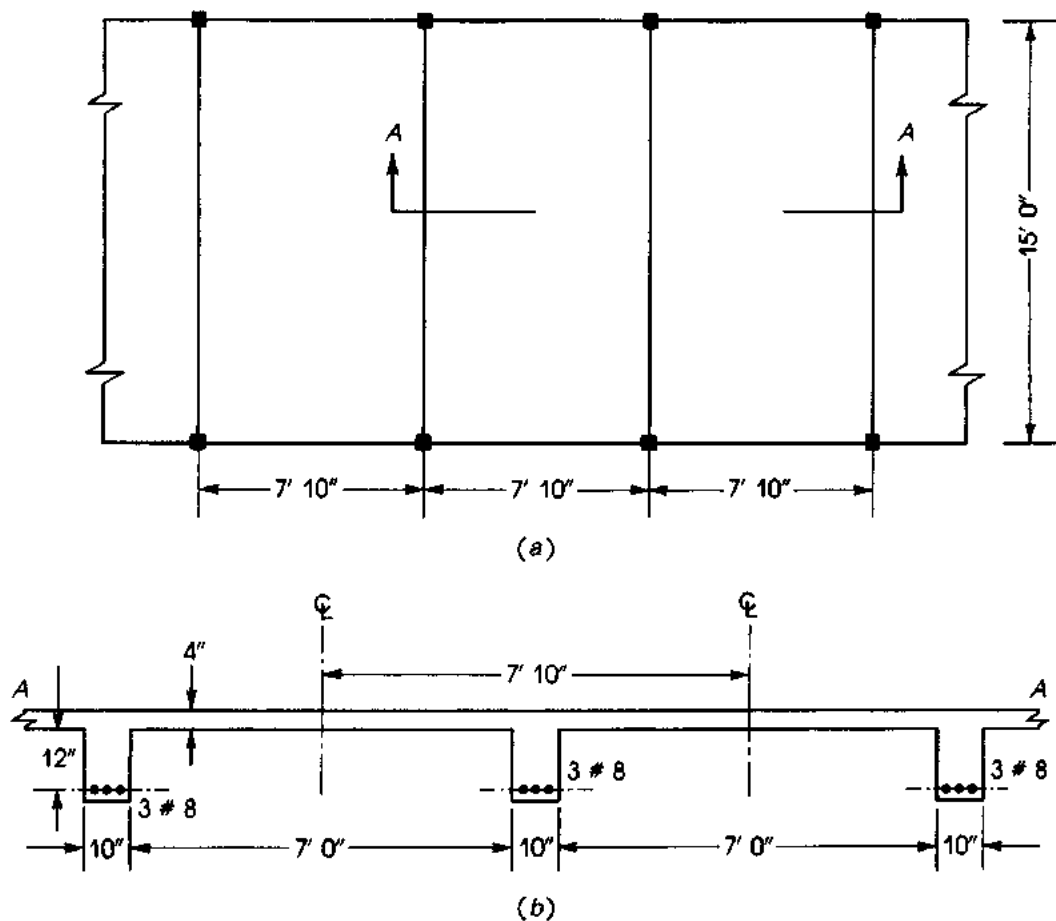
Example 3.11: (a) plan of slab-beam roof and (b) section A-A.
